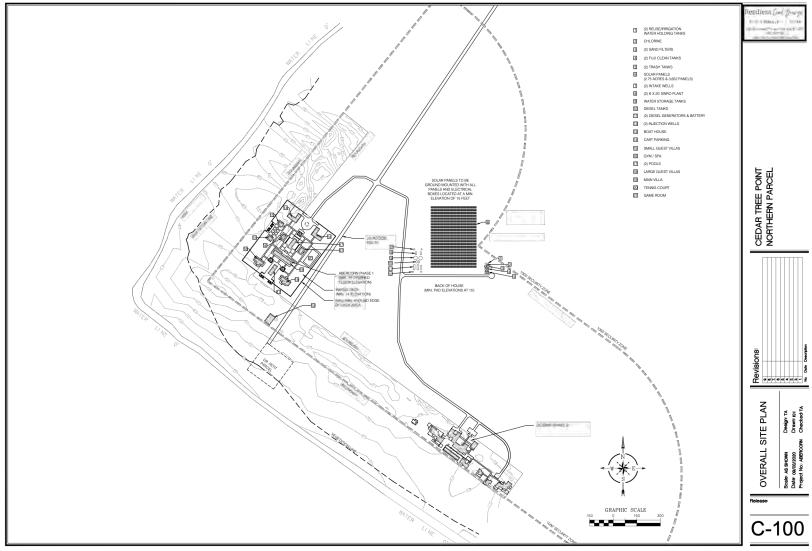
Preliminary site plan for the construction proposed on Cedar Tree Point, Barbuda.
